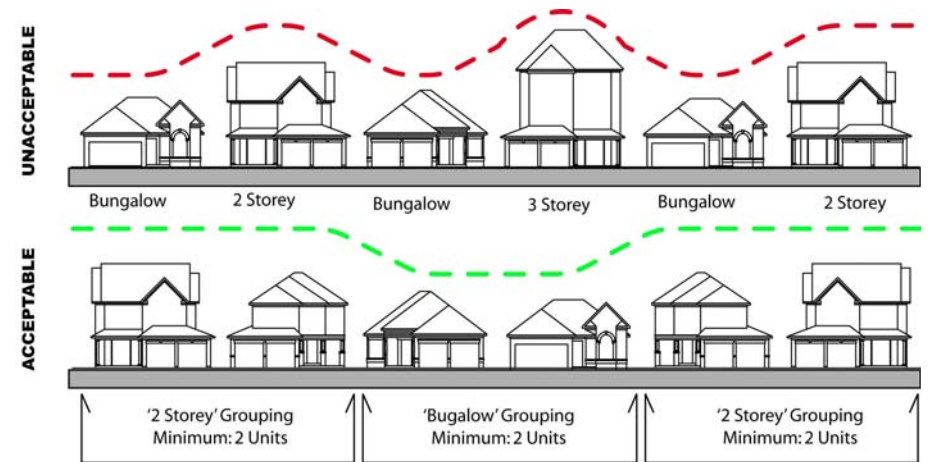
Dwelling massing within the streetscape should avoid jarring contrasts
